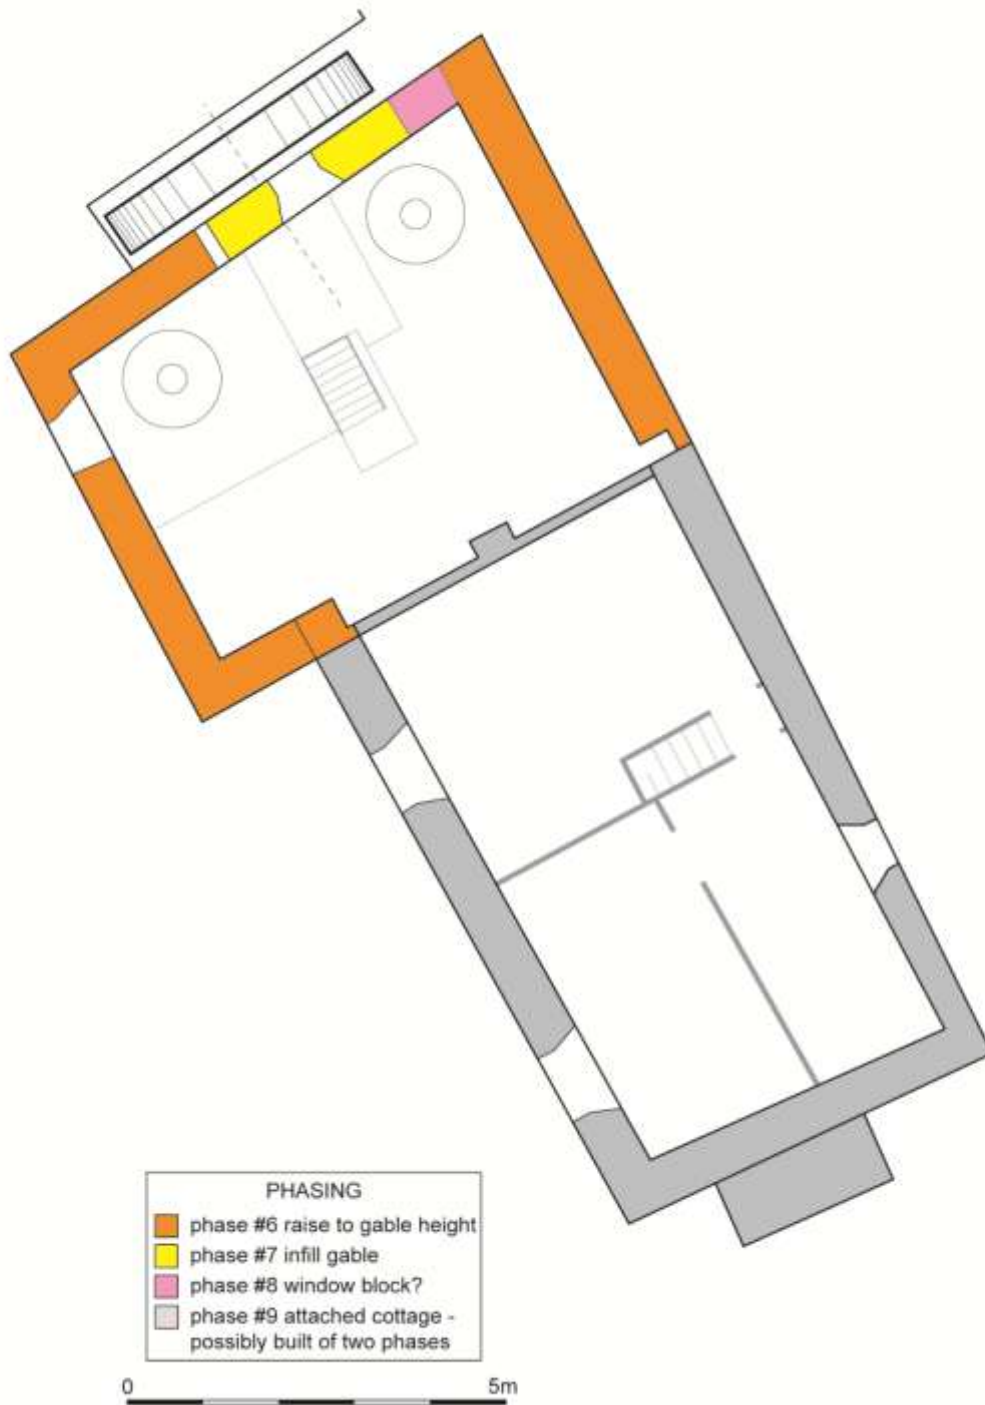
Phased first-floor plan, schematic plan based on existing architect's drawings.
